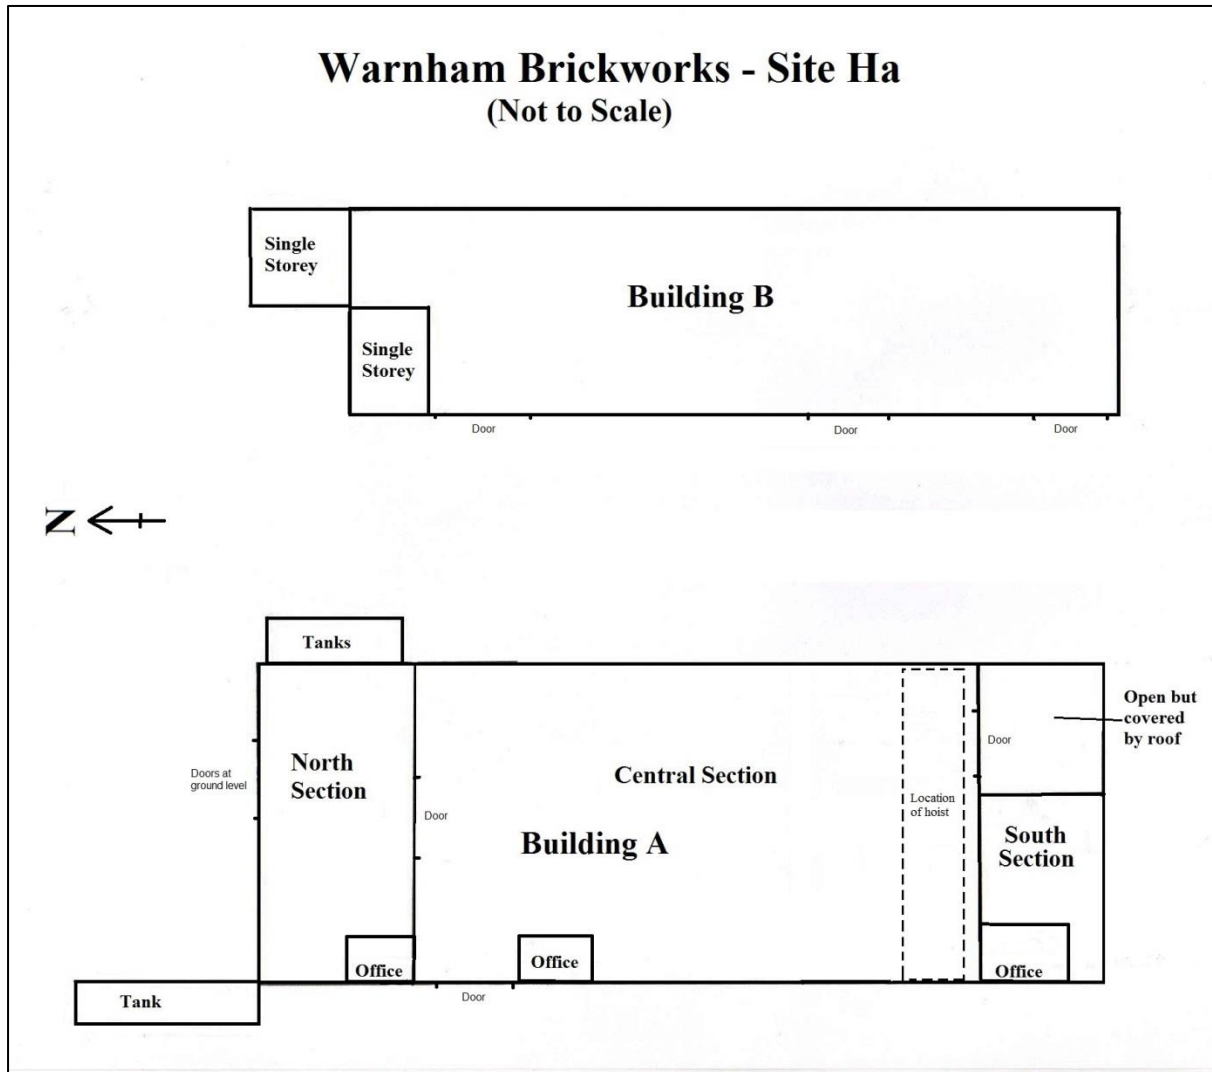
Warnham Brickworks: Sketch Plan of Buildings
